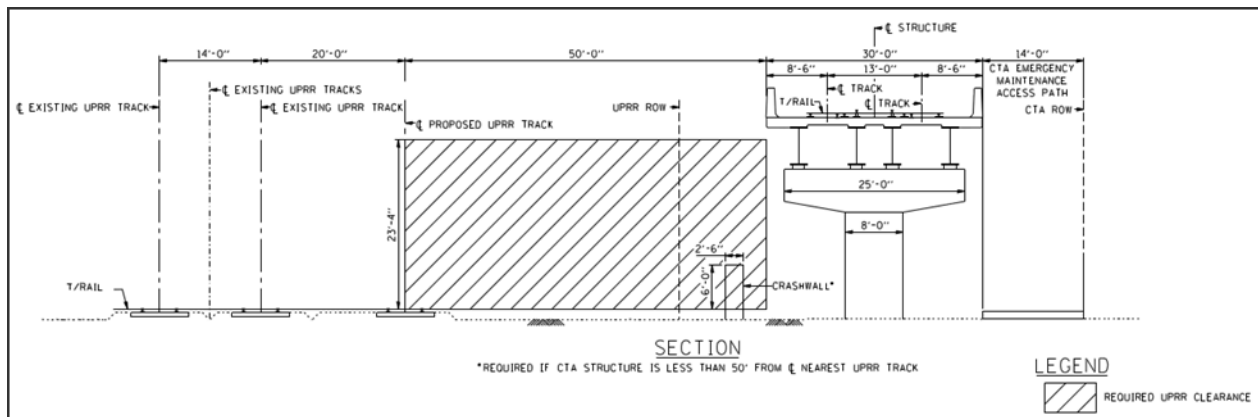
UPRR Rail Alternative Side Option Typical Cross Section
